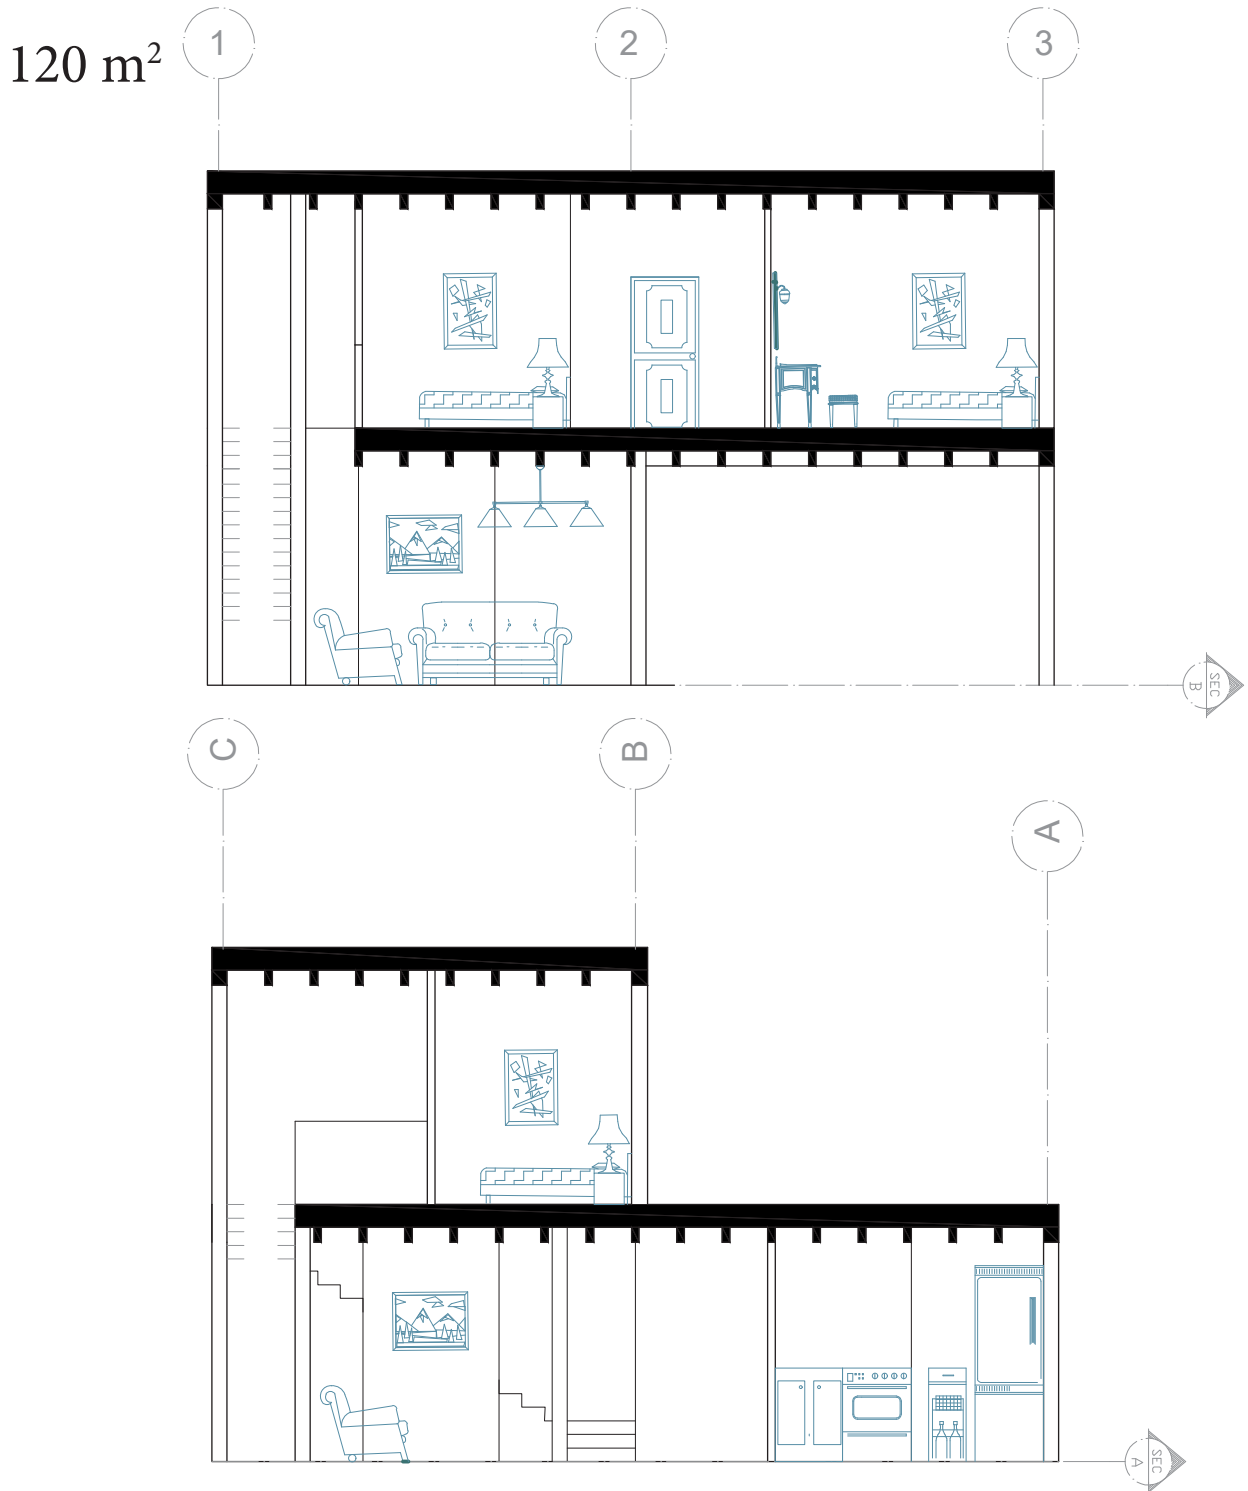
plan unit 120 m² SC 1.100 (source: author)
